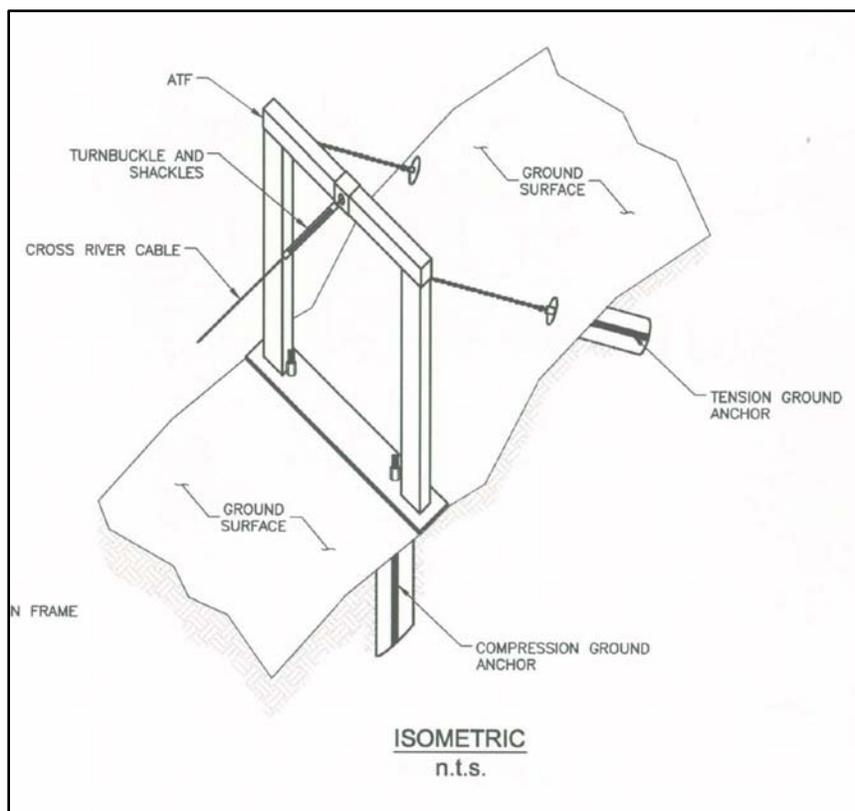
Typical Anchor Site and ATF. Source: J.F. Sato 2007
